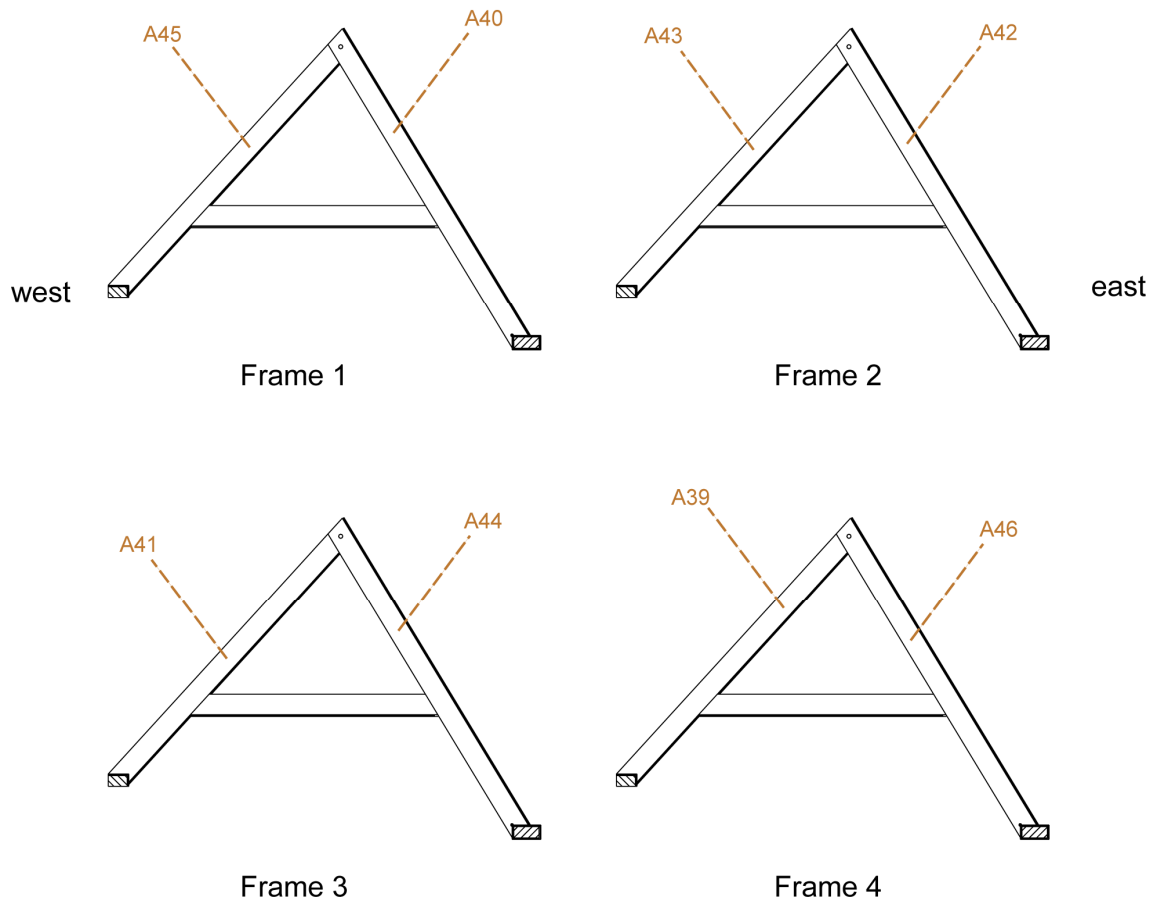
Matted passage trusses, showing the locations of sample APT-39-46
